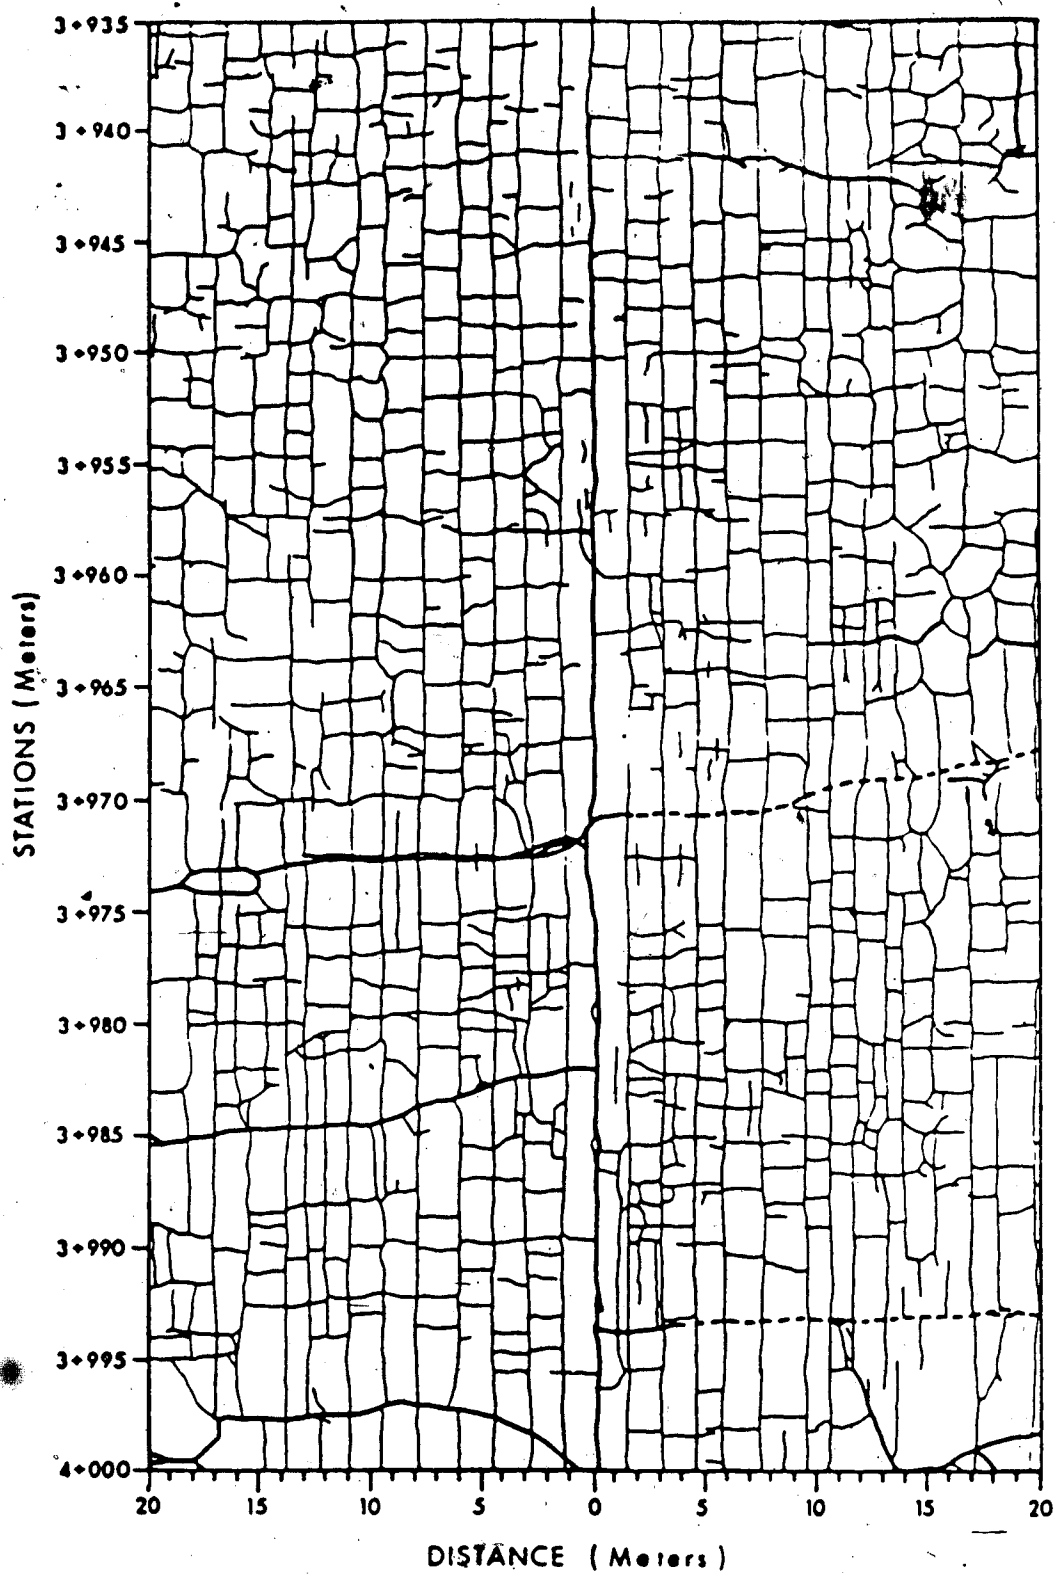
CRACK MAP OF TEST AREA BEFORE OVERLAYING
